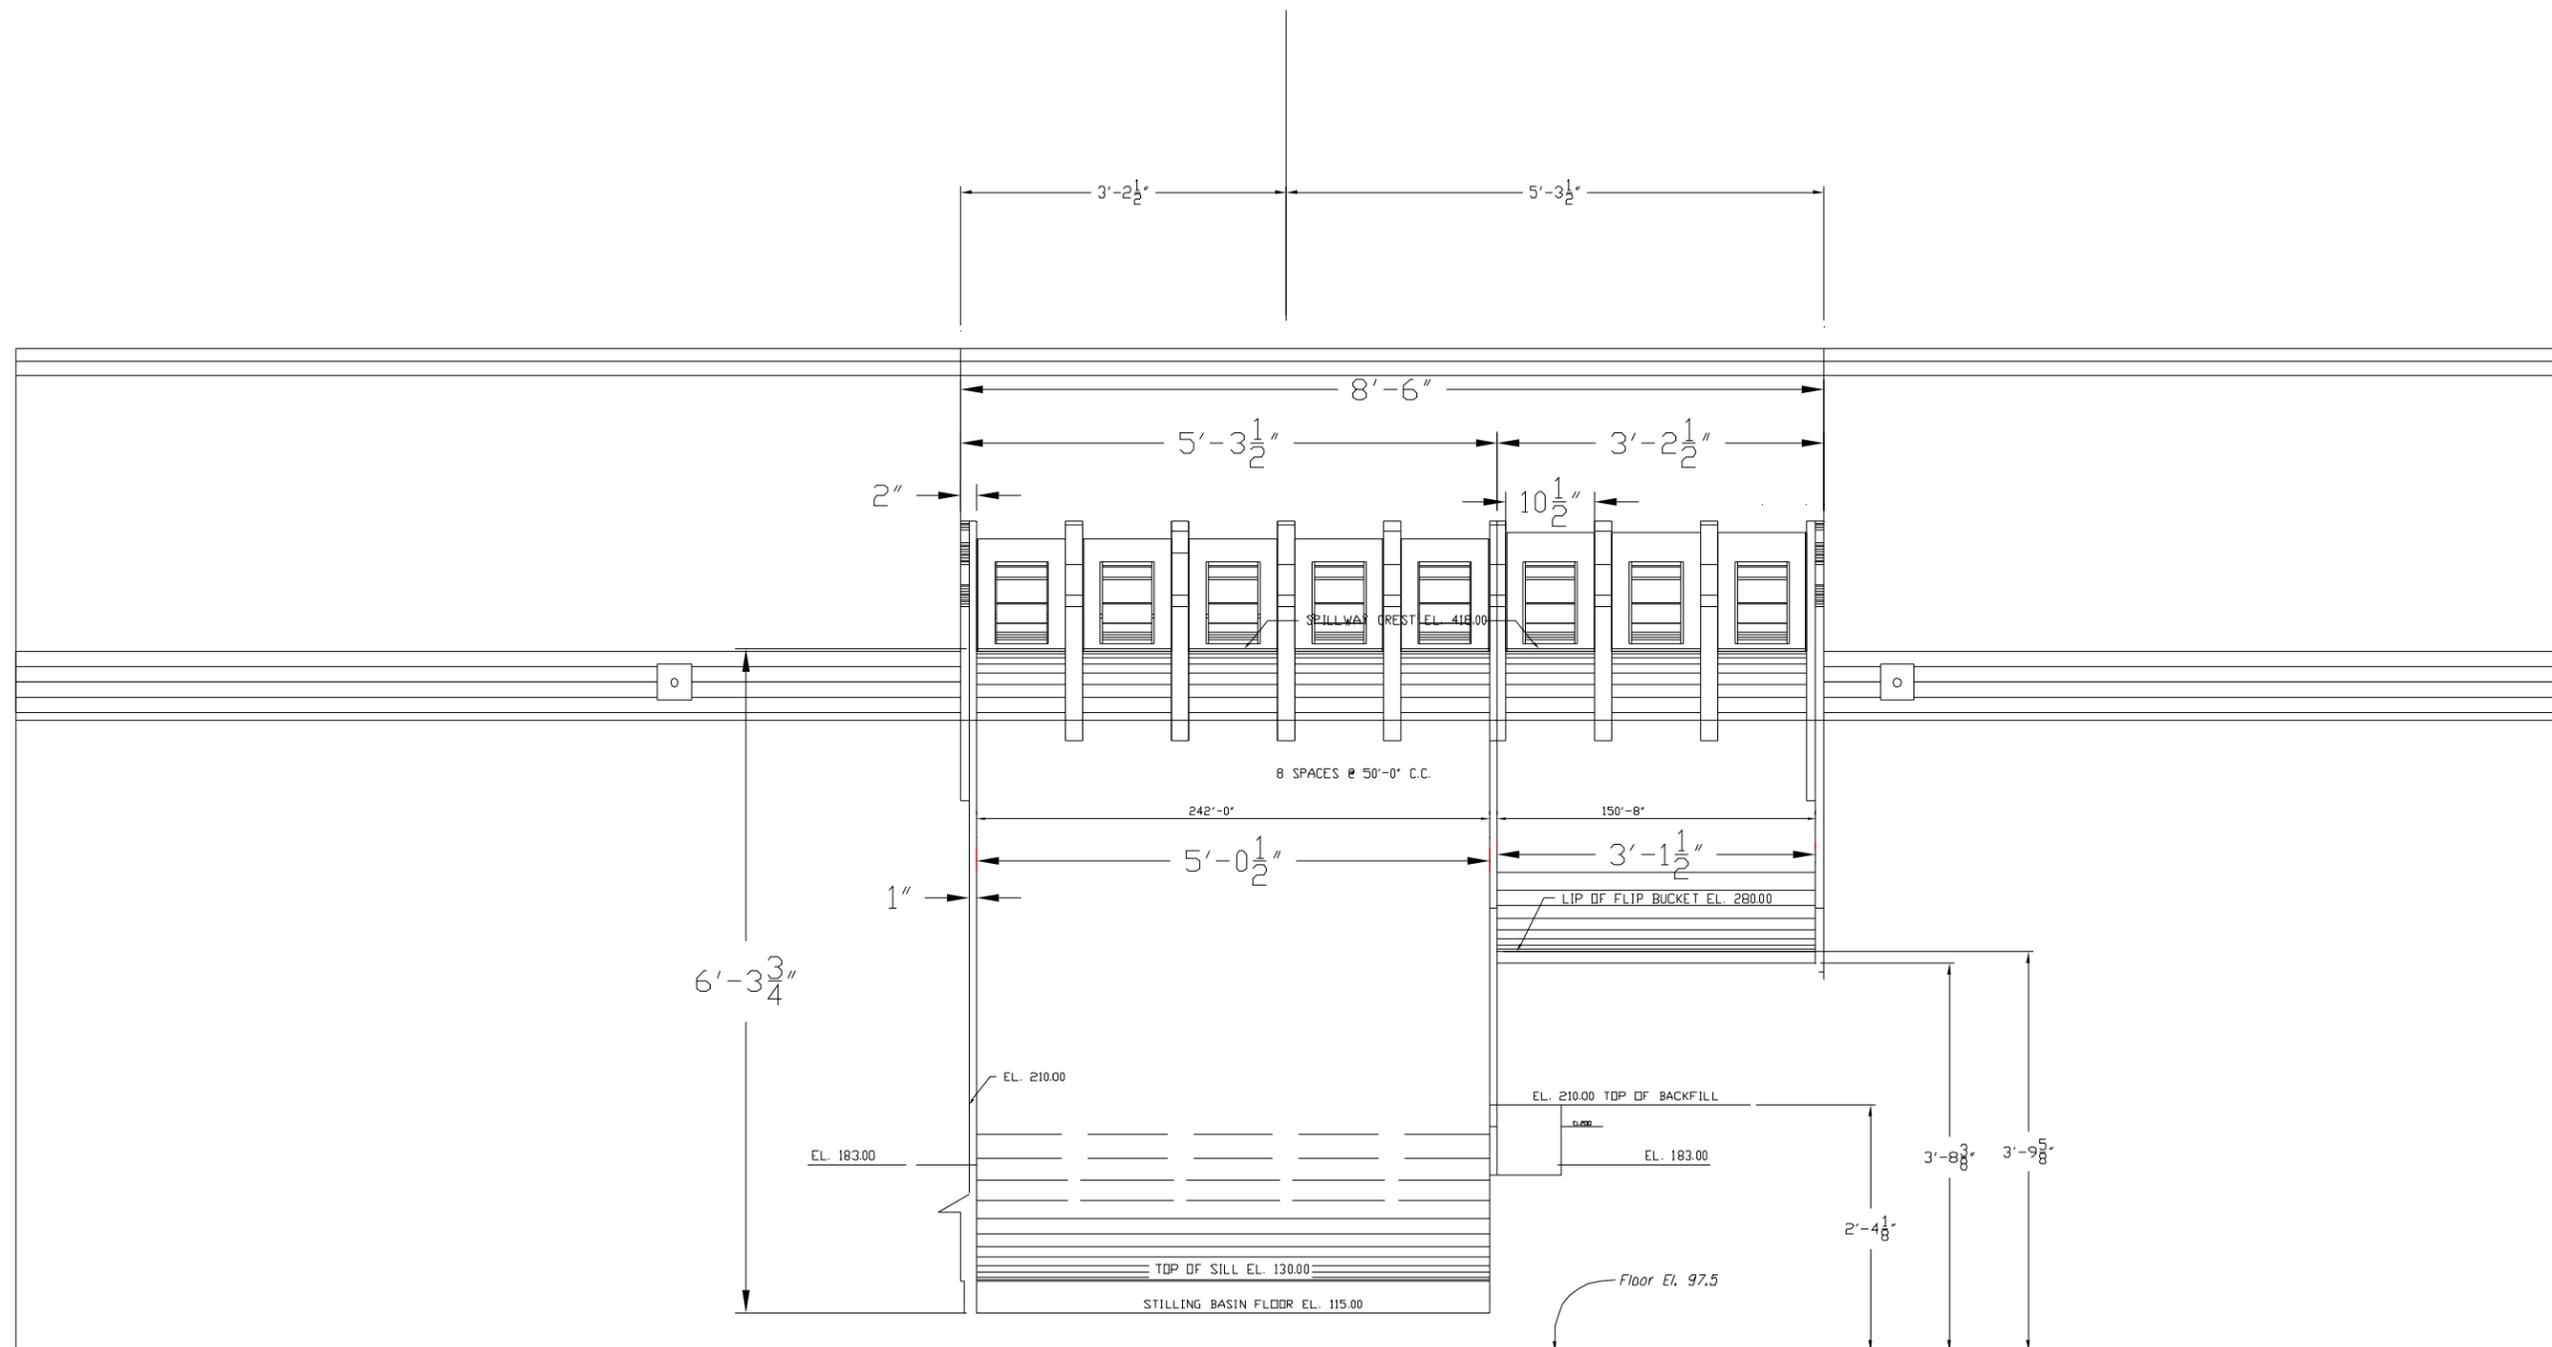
Model construction drawing: Profile view of main dam spillway looking upstream.
